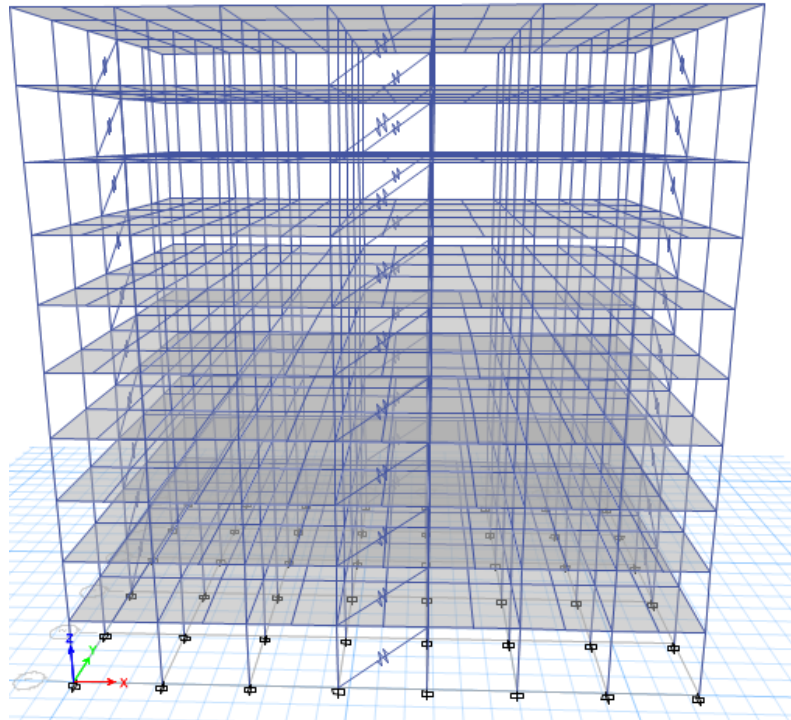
Dampers located in outer mid-frame for 10-story steel building
